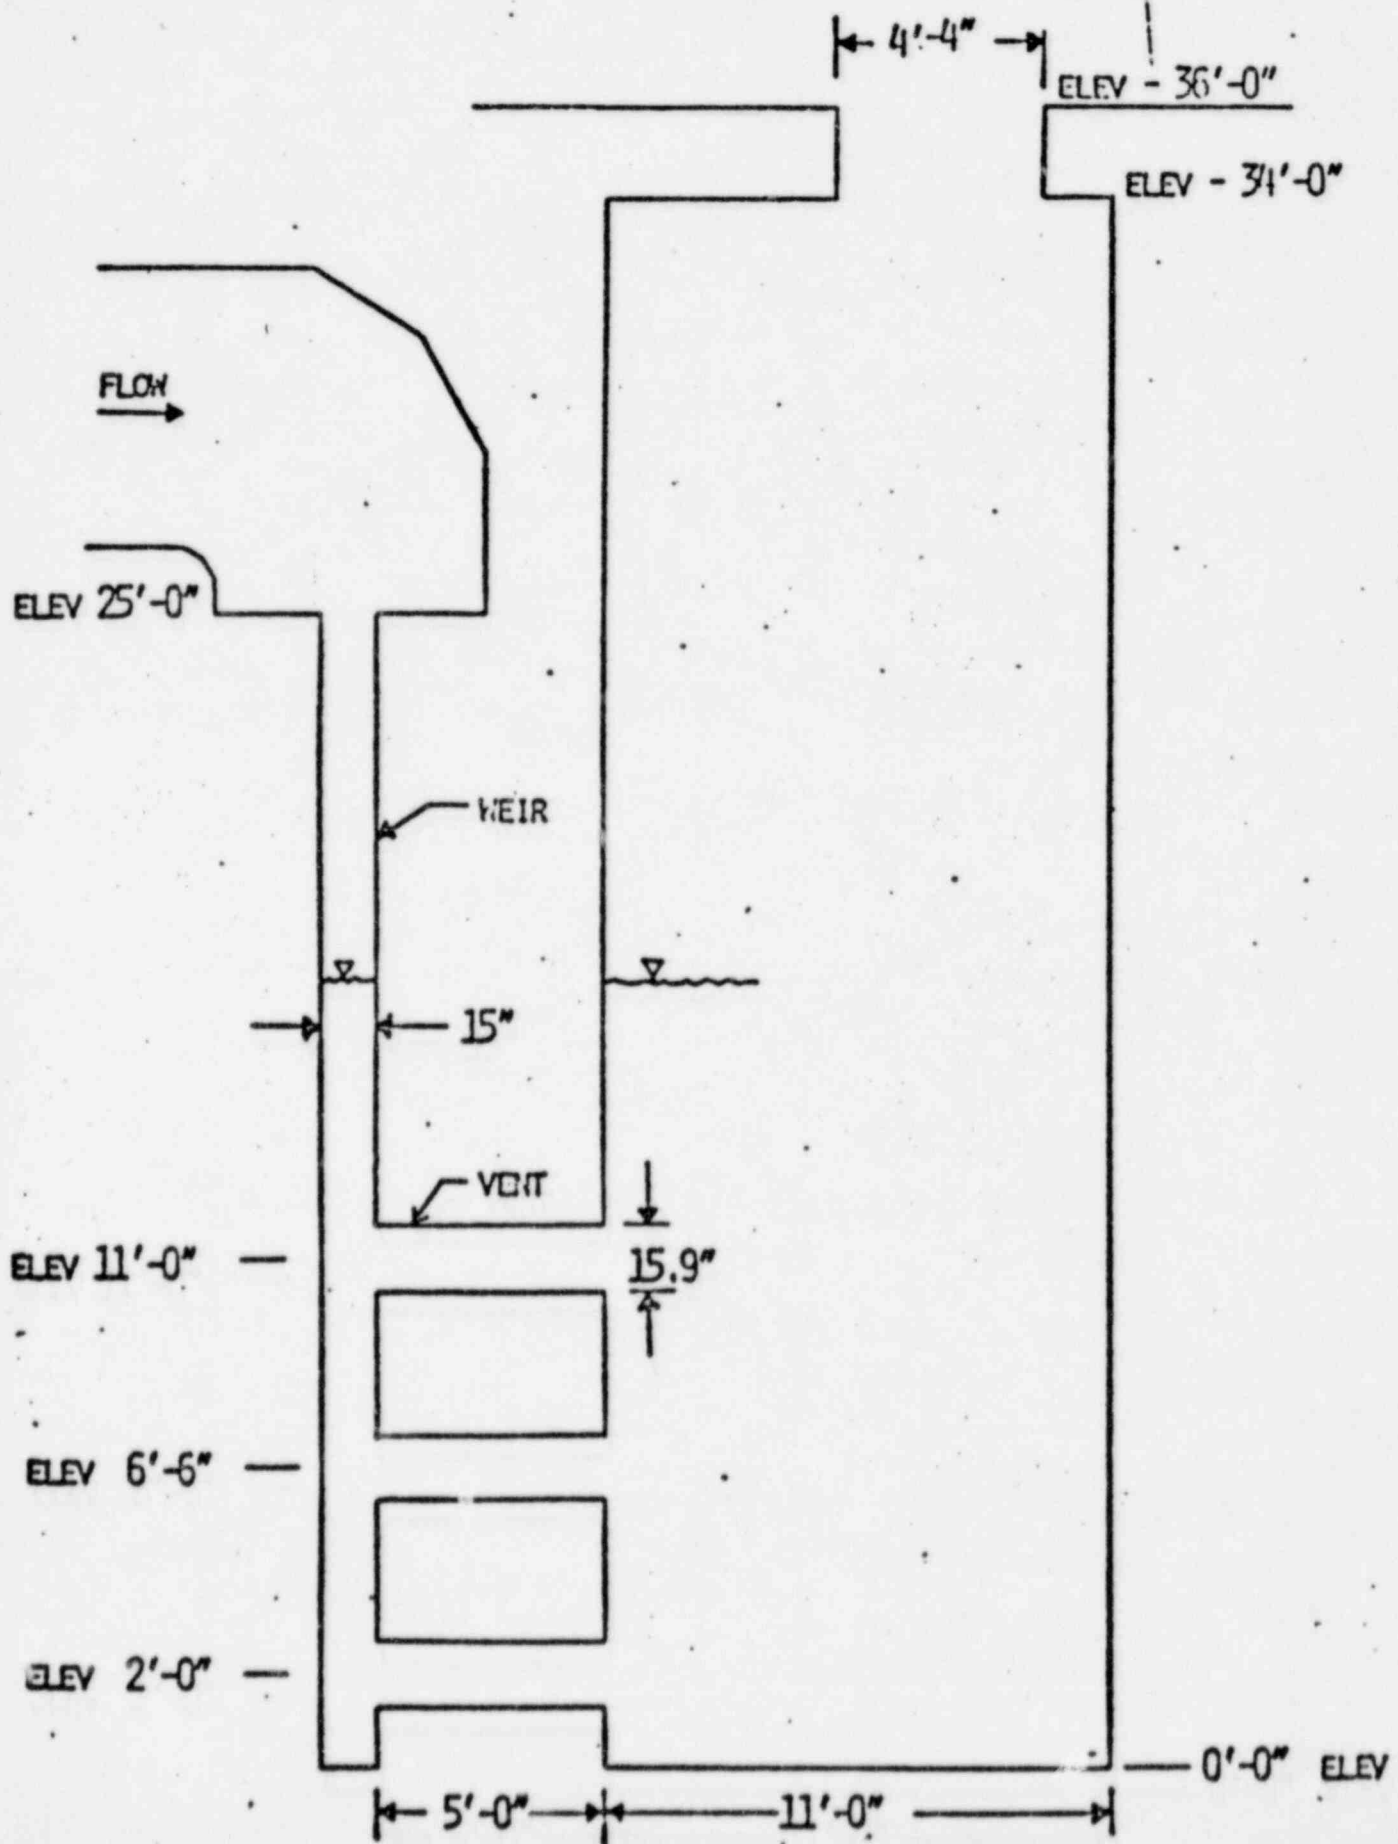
TYPICAL HORIZONTAL VENT TEST SECTION
